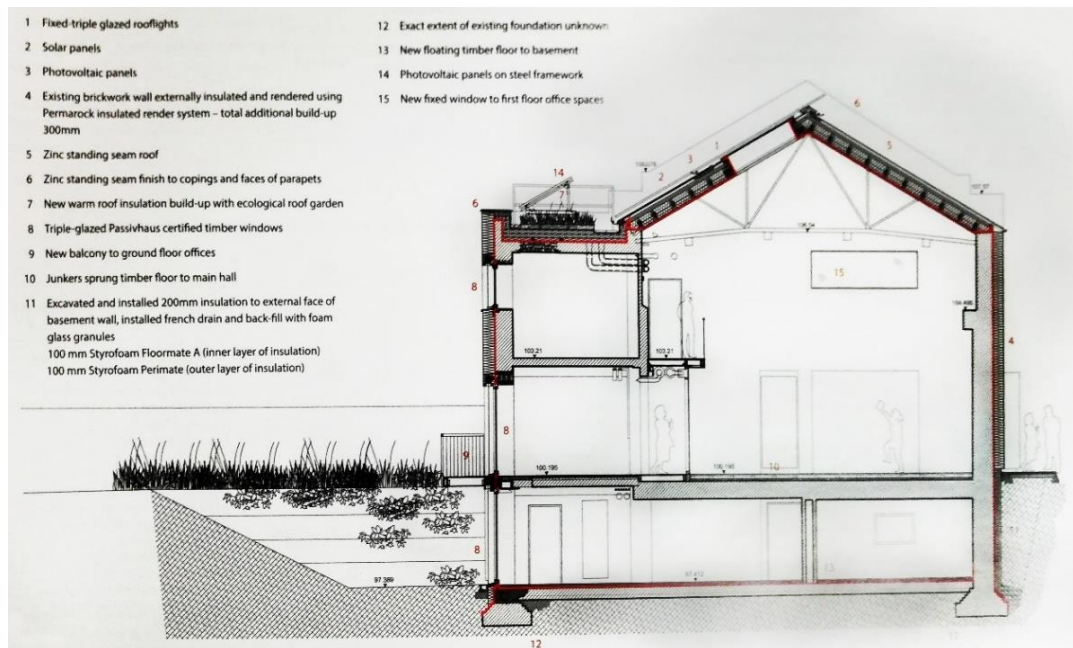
The section of the renovated building shown by Penoyre & Prasad (2014)
